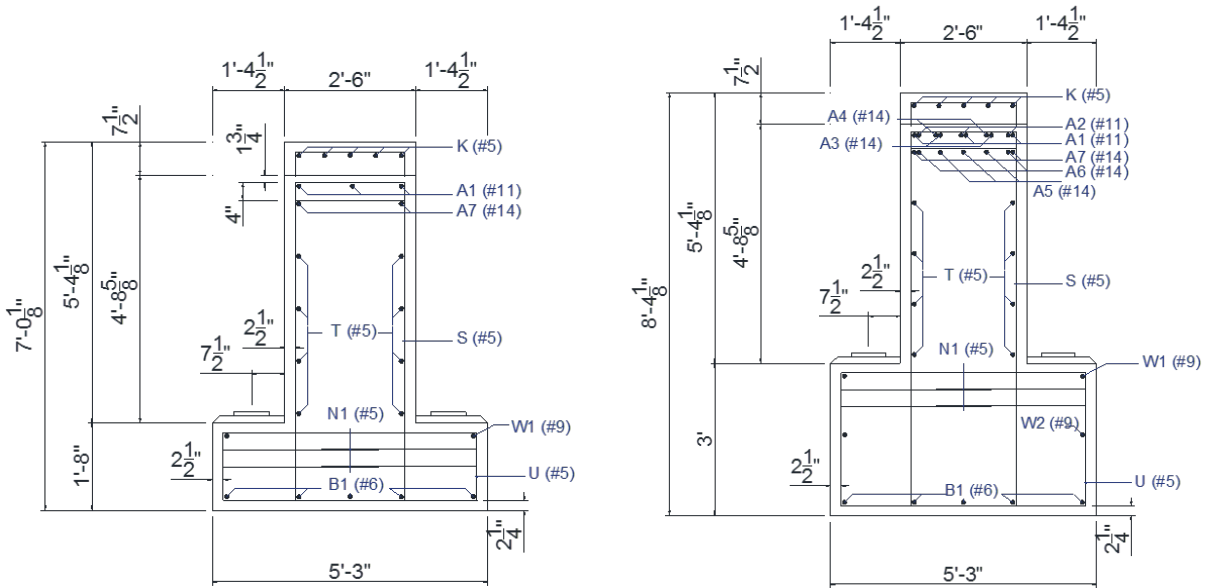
Elevation and Cross-Section of Southbound Bent 13.
